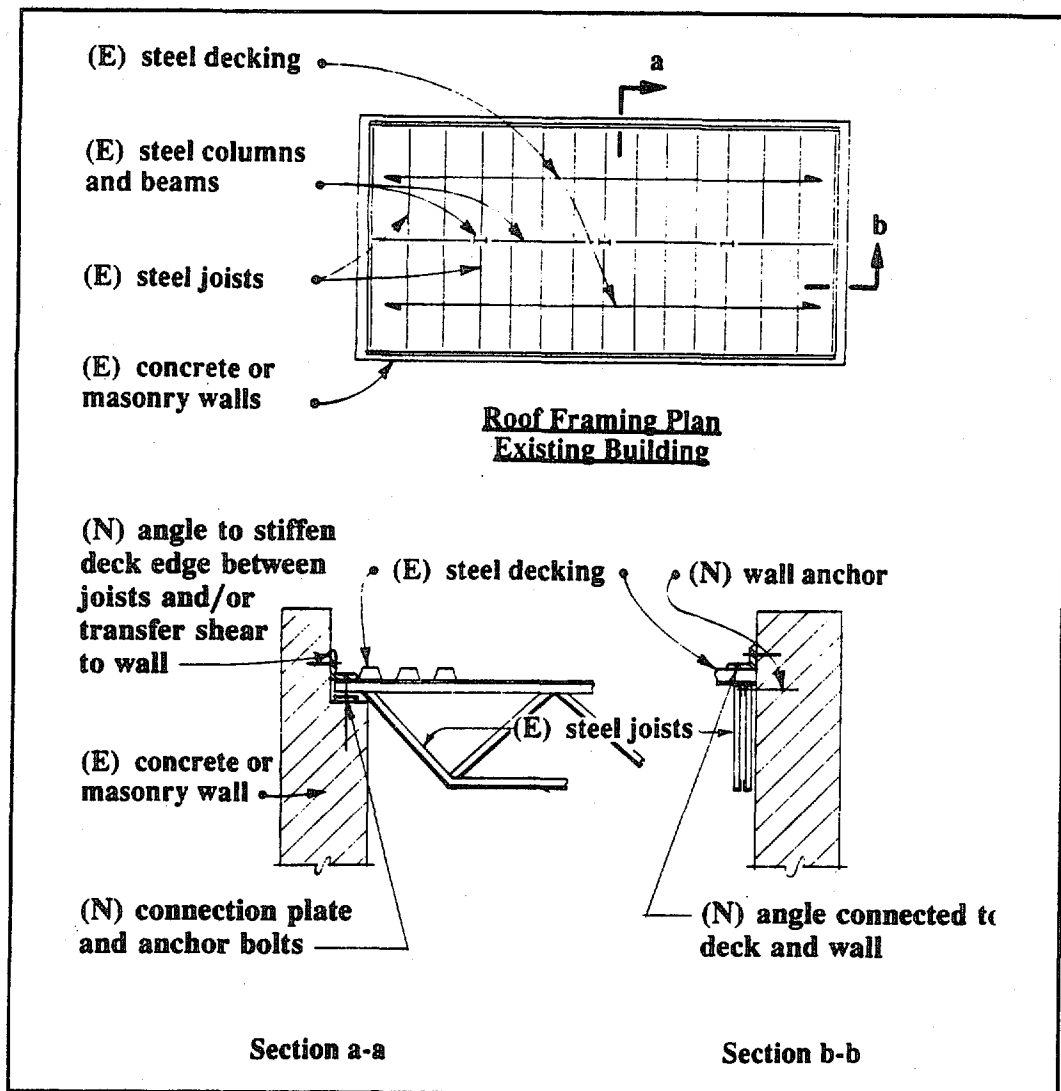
Strengthening an existing building with steel decking and concrete or masonry walls.
